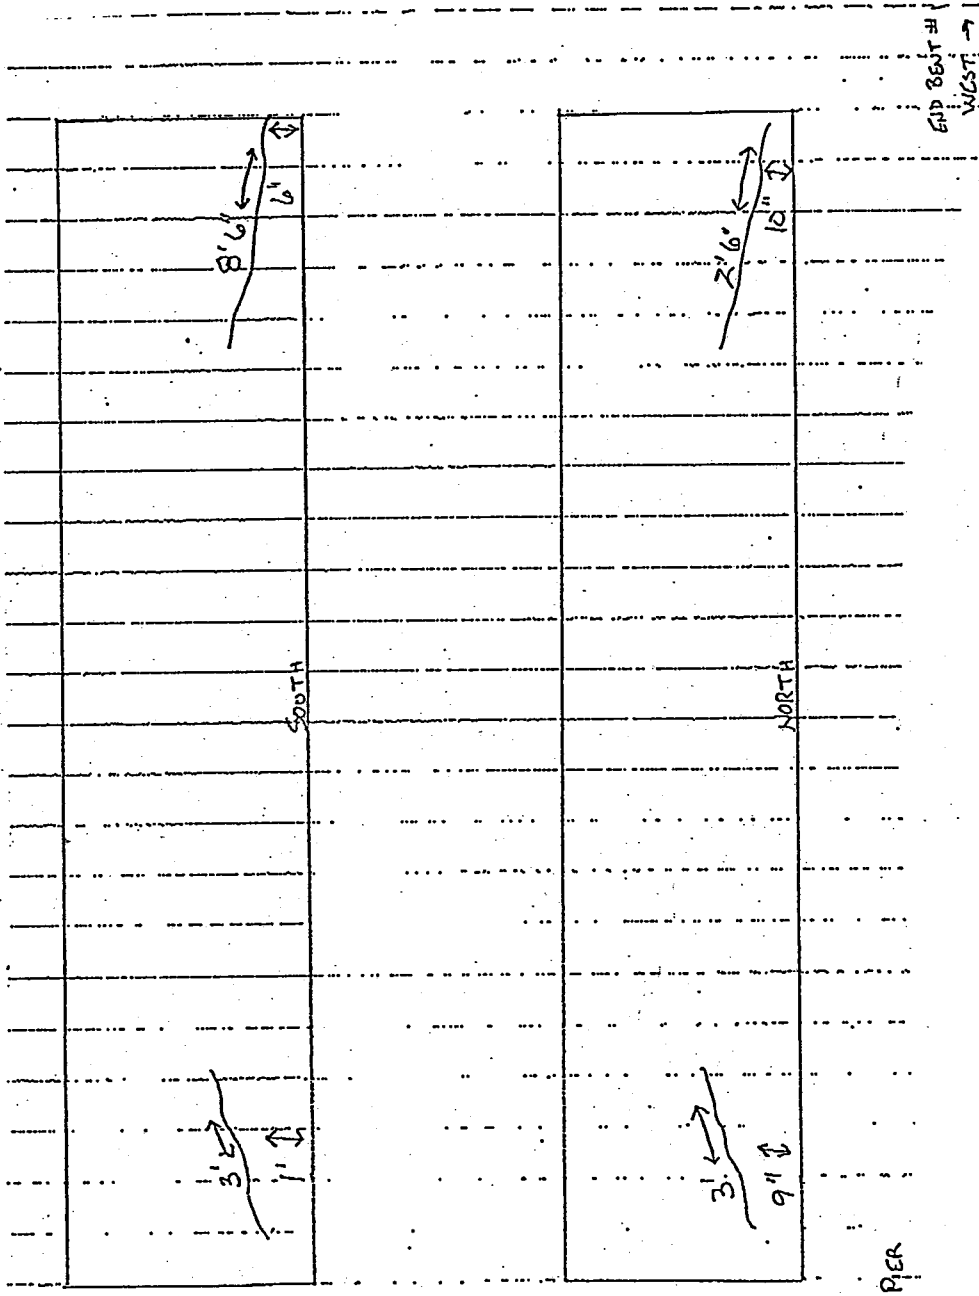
Crack of South Interior Girder over I-75 SB
